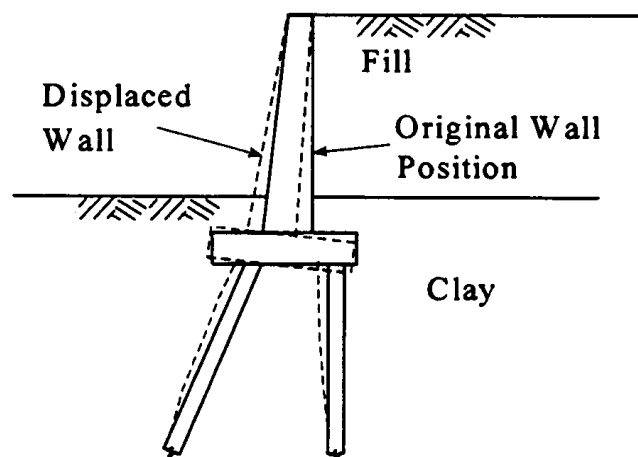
Typical Movement of pile-supported cast-in-place (CIP) wall with soft foundation.
